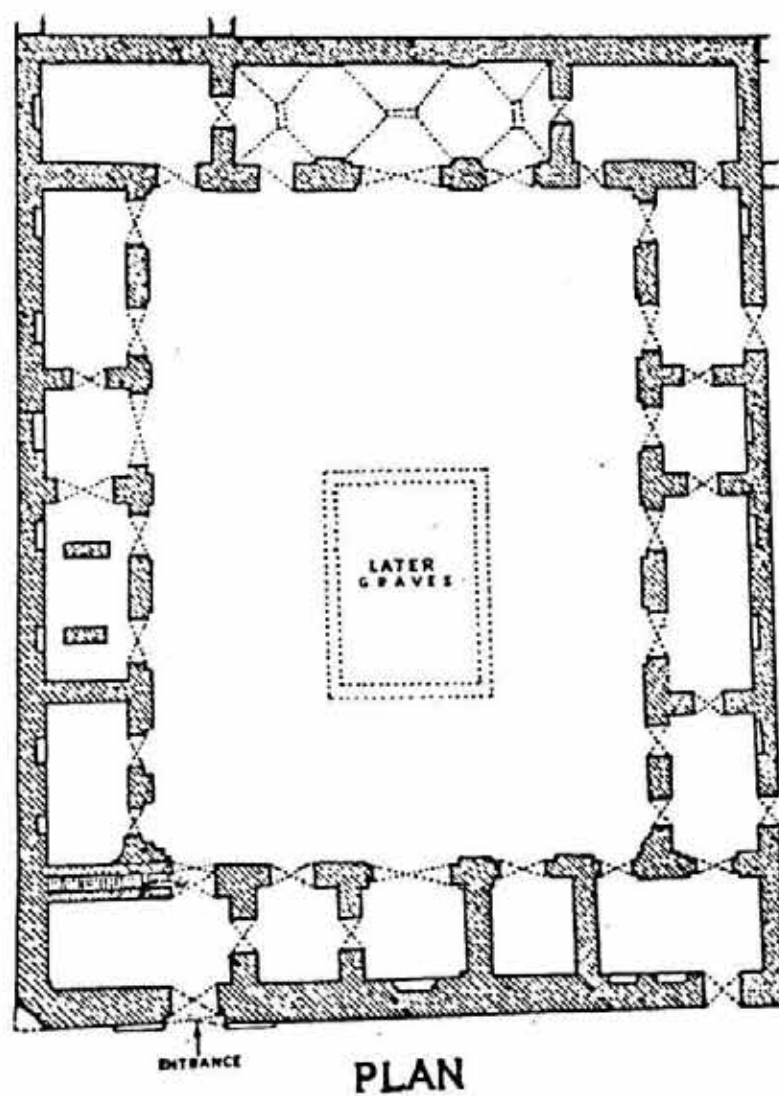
New Delhi: Plan of the house in Sarai Shahji. See page 188.
